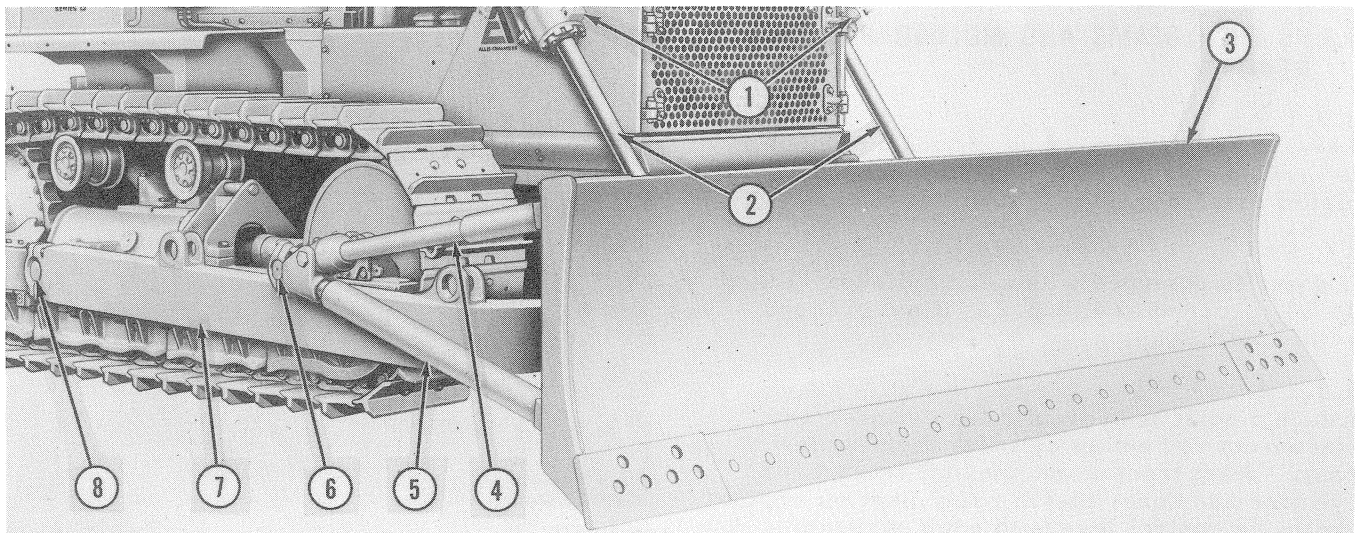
11HA DOZER (HYDRAULICALLY — OPERATED, ANGLING MOLDBOARD) T-76718
